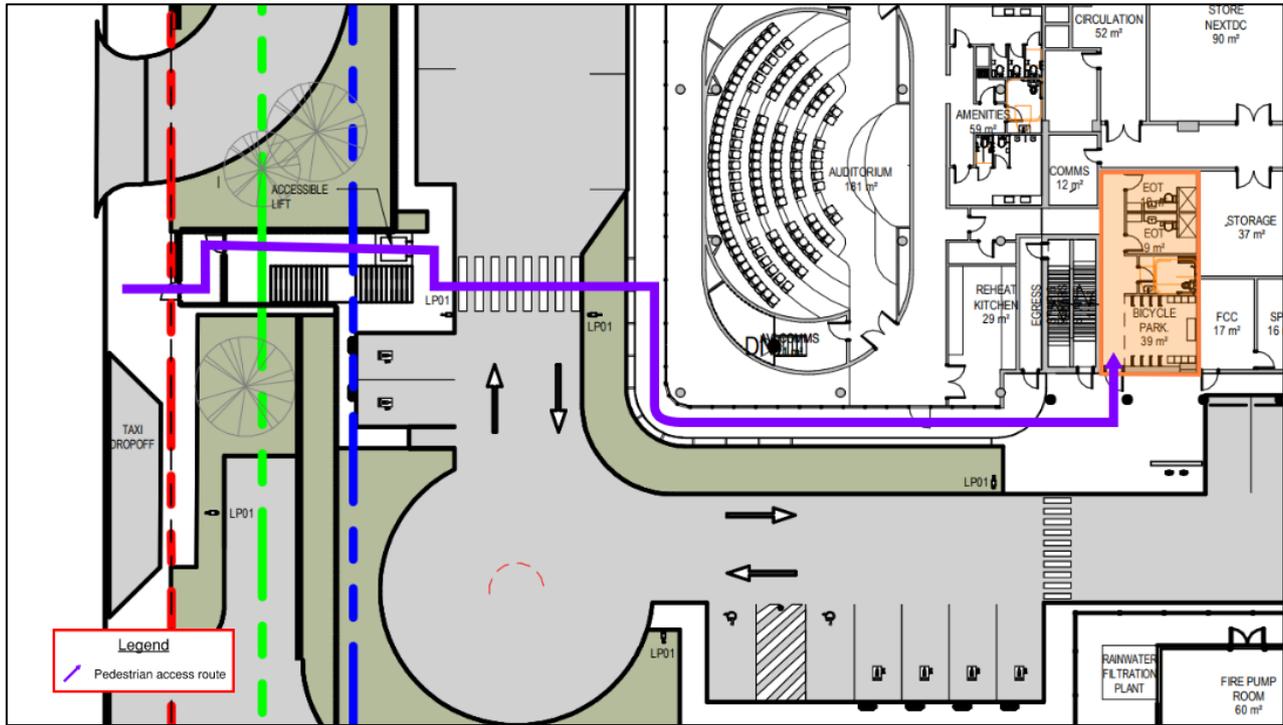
Building A – Proposed End of Trip Facilities and Pedestrian Access
